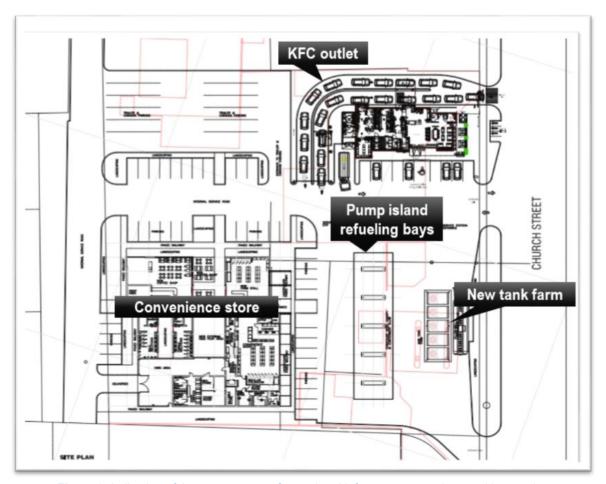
Indication of the arrangement of associated infrastructures and general layout plan
